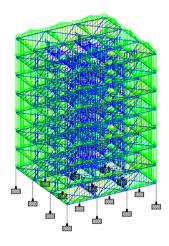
Assining of Interior Wall Load (12.04KN/m)
